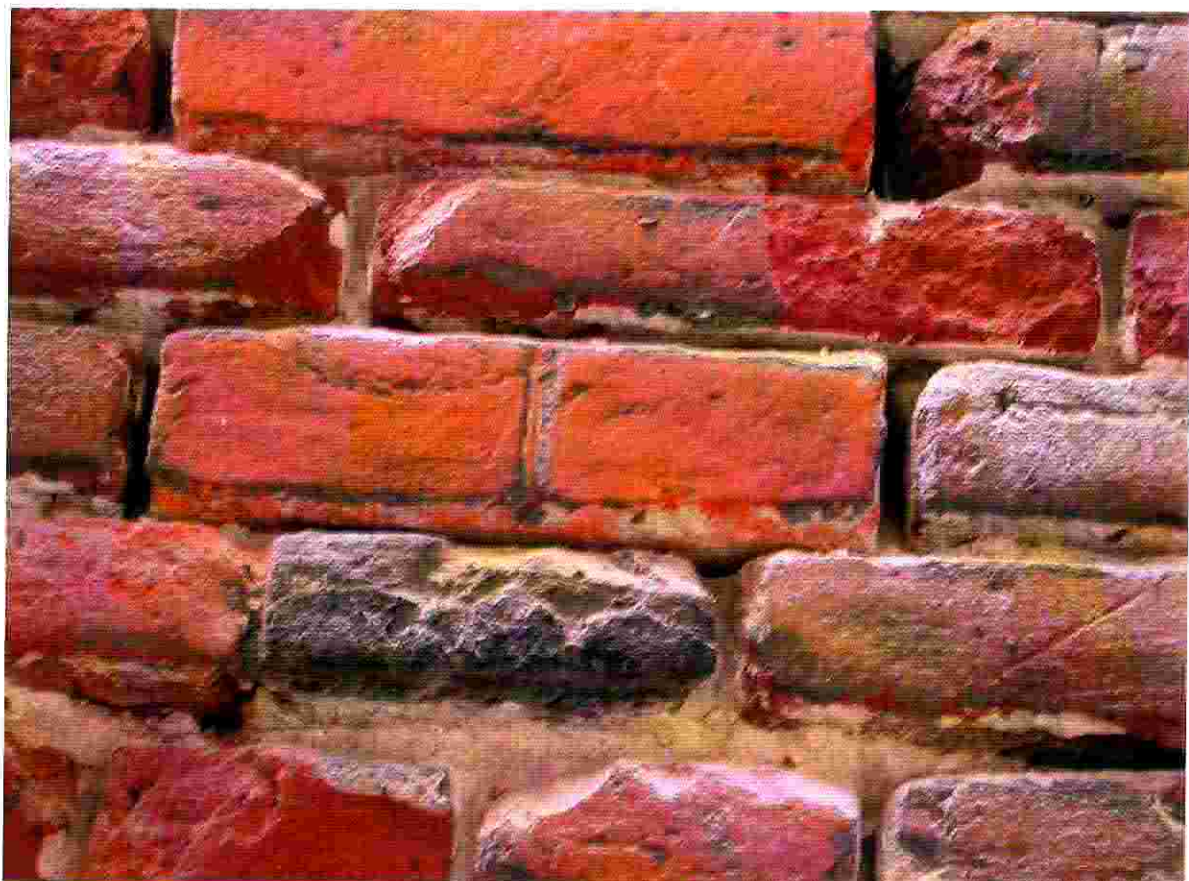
Chapel Court, North Facing Elevation - 19th century repair with stretcher cut to look like headers
